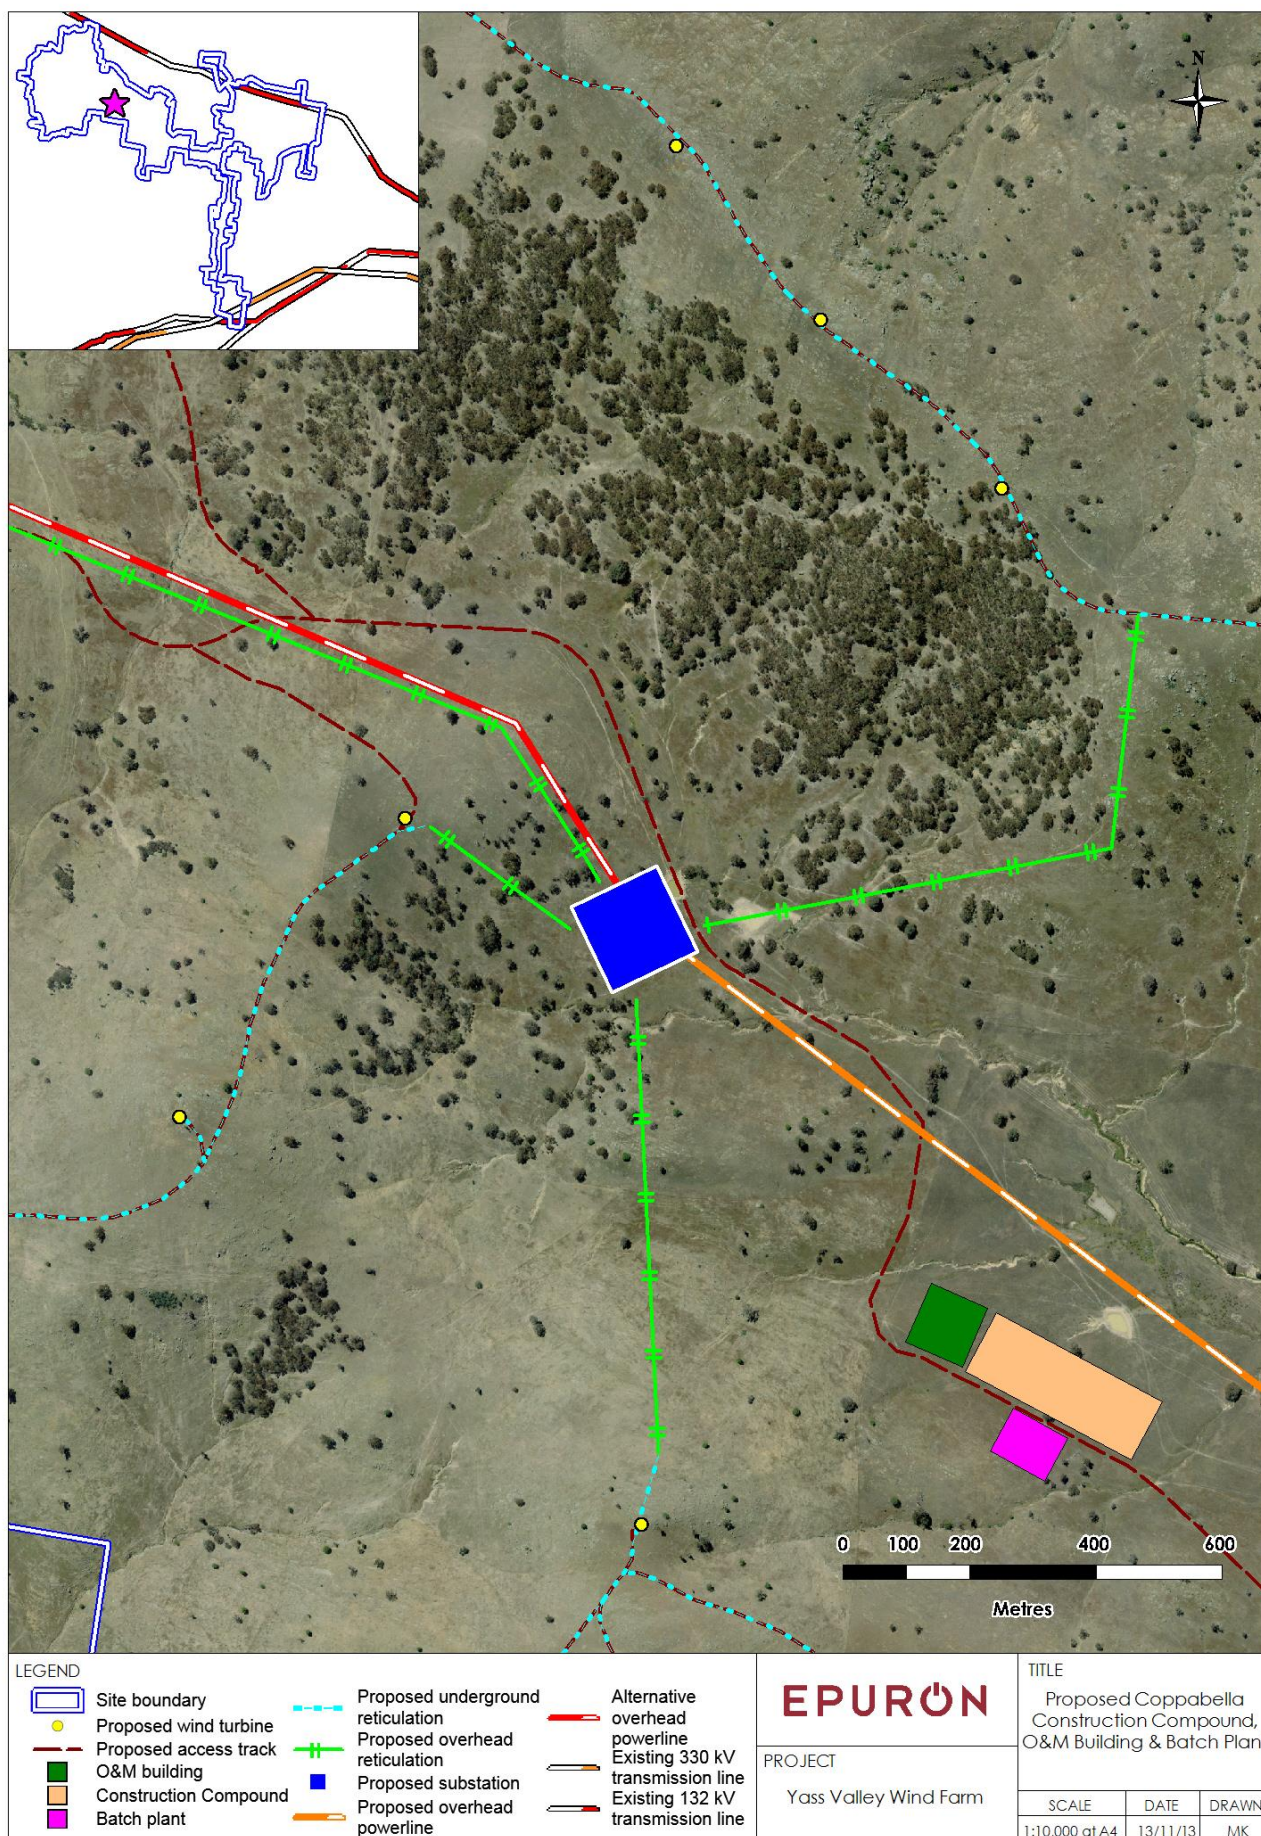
Coppabella collection substation, construction compound, O&M building and batch plant
